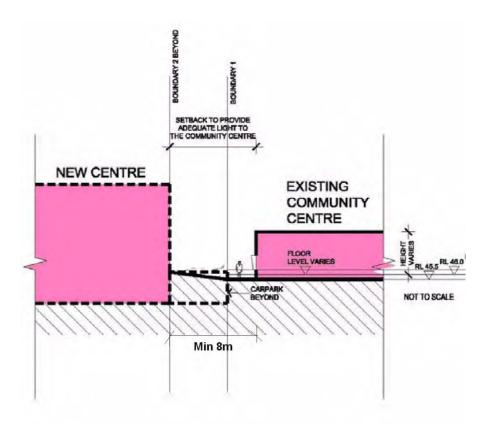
Specific Street alignment and building setback diagram(s)
